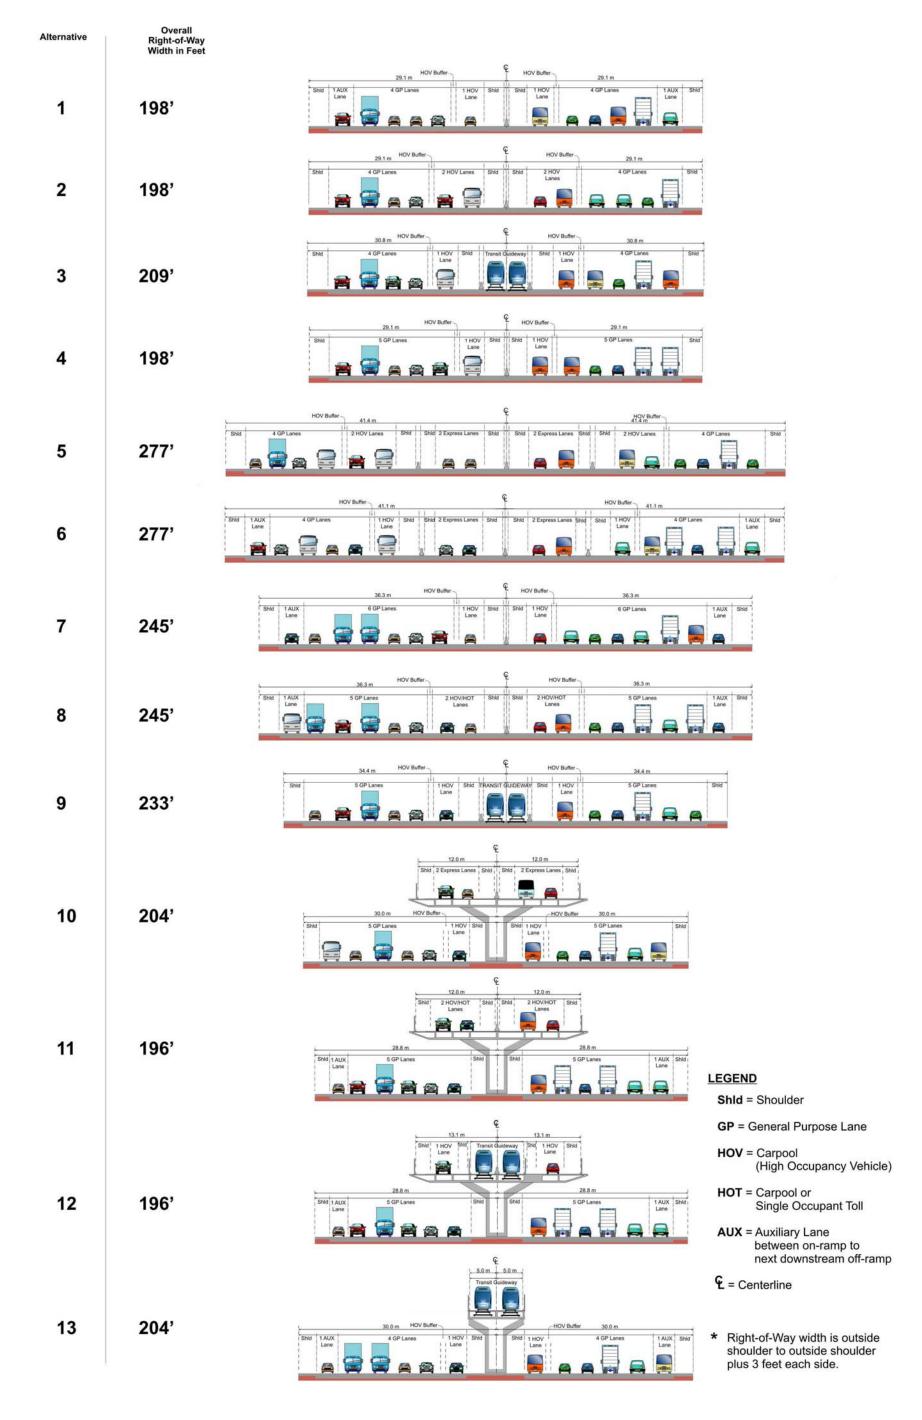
Typical Cross Section between Brookhurst Street and Valley View Street of the Thirteen Conceptual Alternatives
